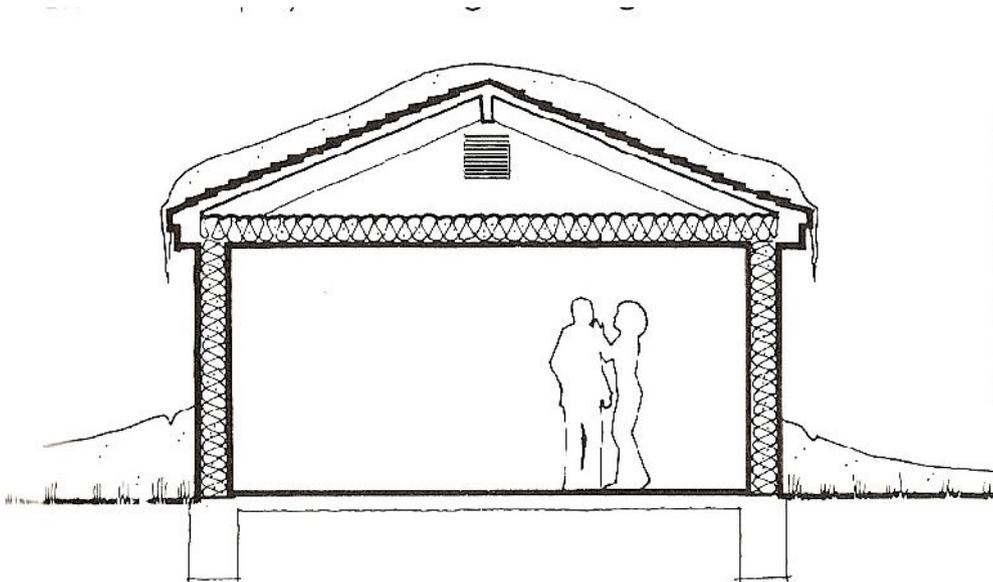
In winter, the attic serves as insulation space between the heated interior and the outside. To maximize benefit, heat should be confined to living areas by insulating attic floor. In summer, ventilate the attic to exhaust heat gained through the roof. Floor insulation keeps heat from transferring into living space beneath the attic.
